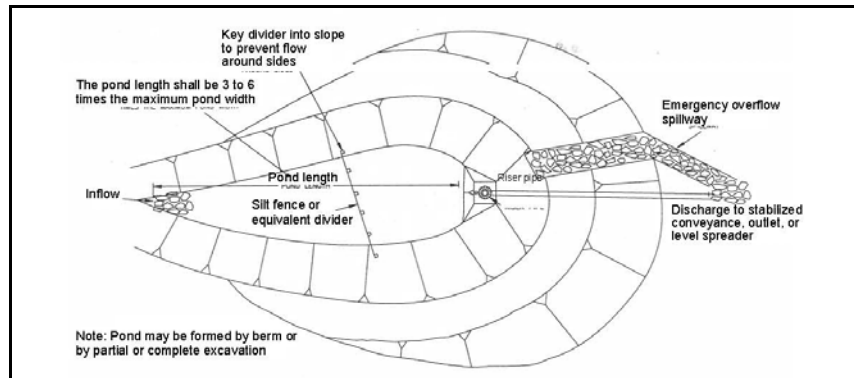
SEDIMENT POND PLAN VIEW
